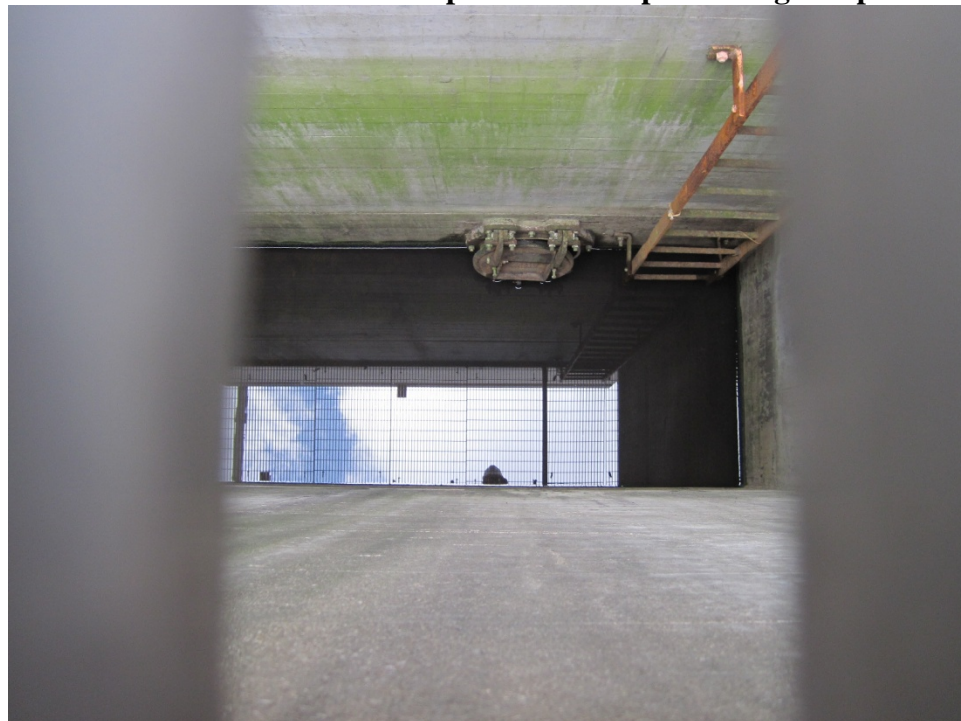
Second Street Pump Station Previous Flap Gate Repair
